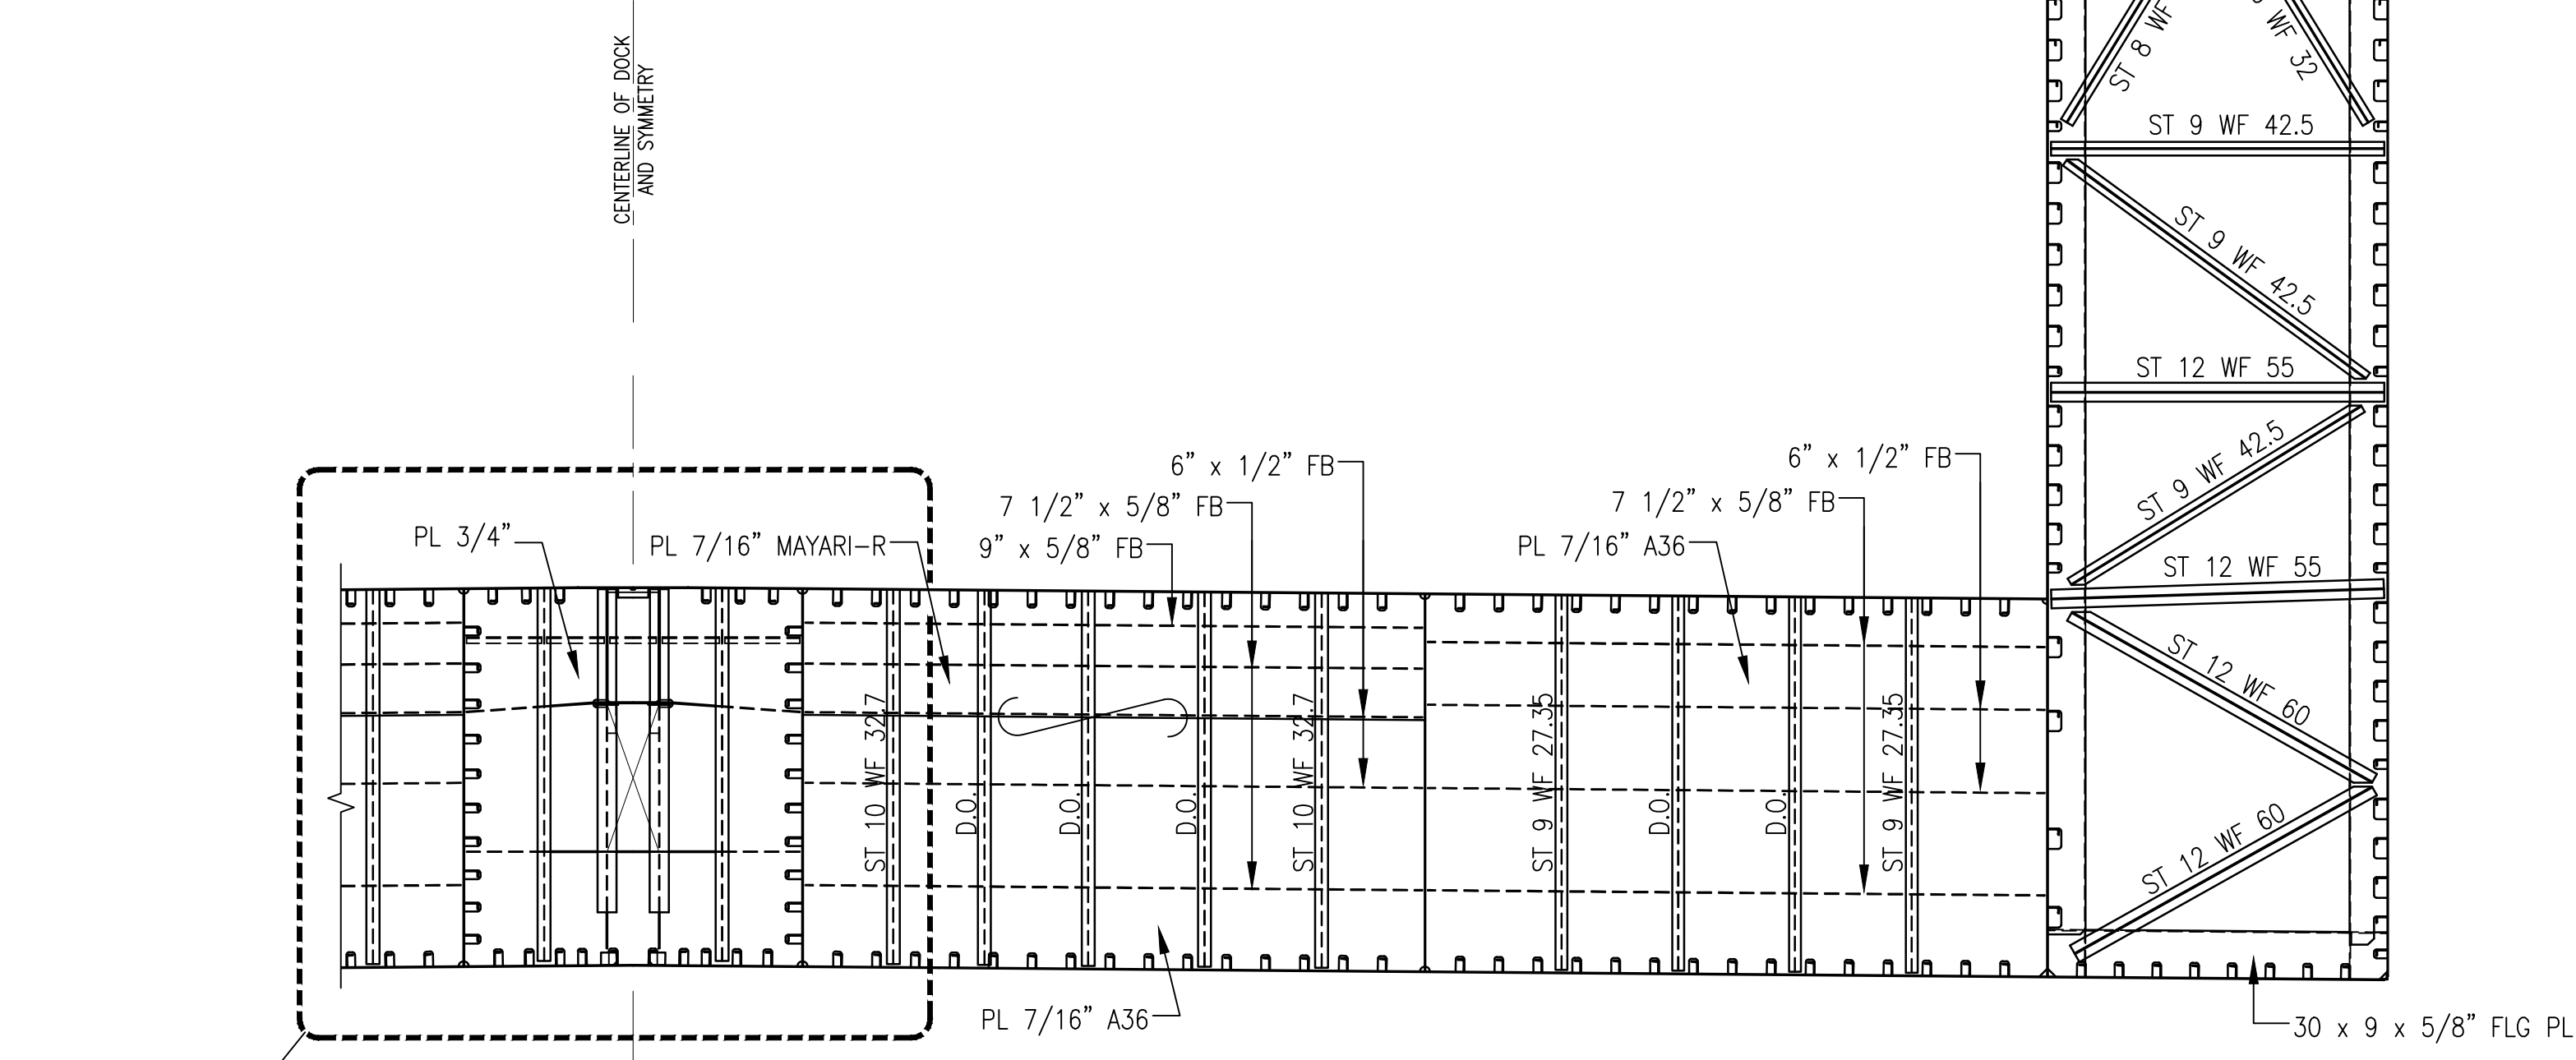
DETAIL - KEEL GIRDER 1'-4 5/8" OFF CENTERLINE
